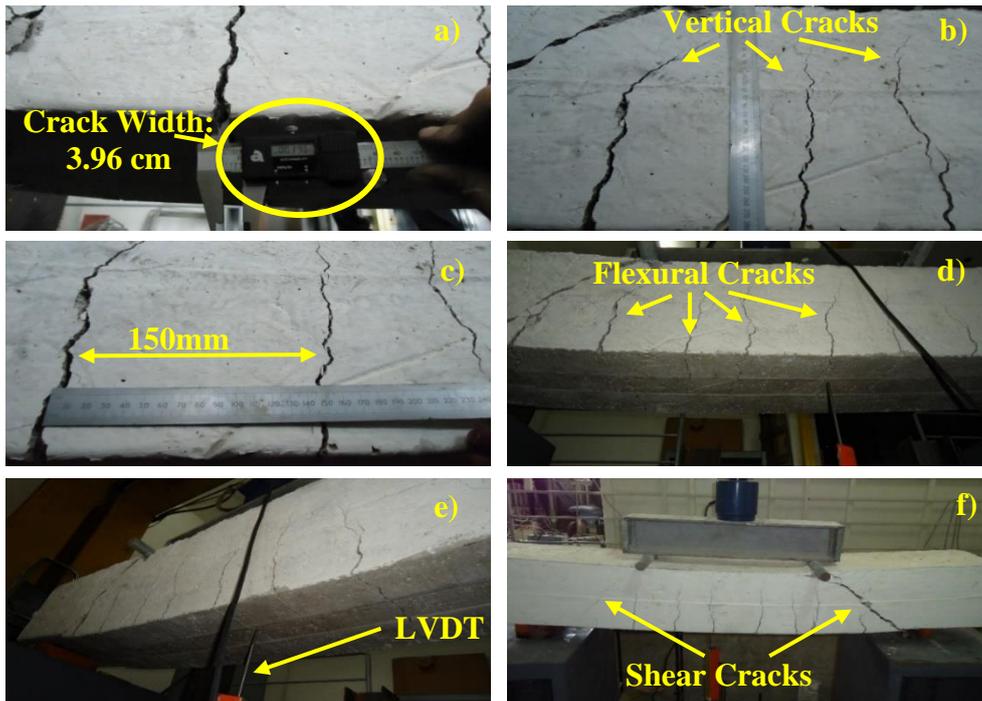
Crack and flexure behaviour of reference concrete beam.
